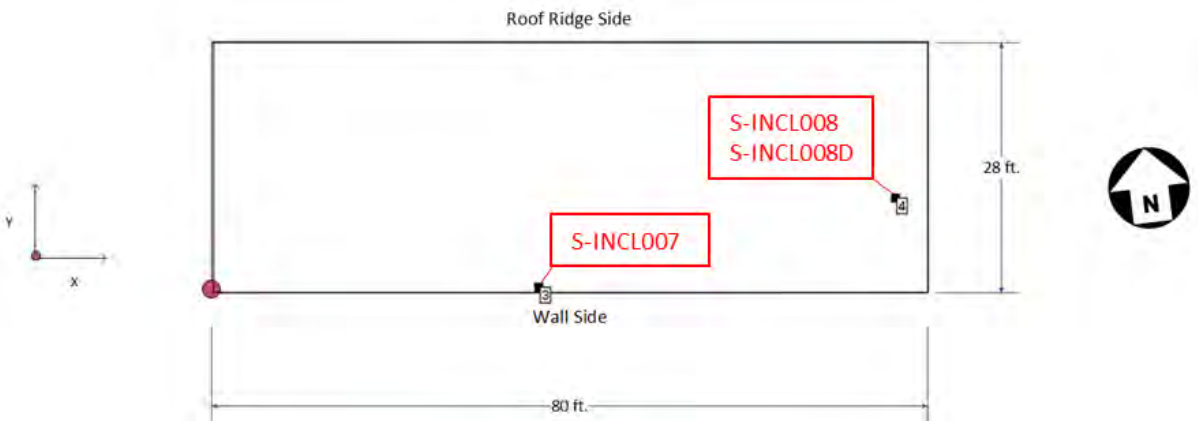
Sample Locations – Interior Metal Structural Columns, Beams, and Supports
